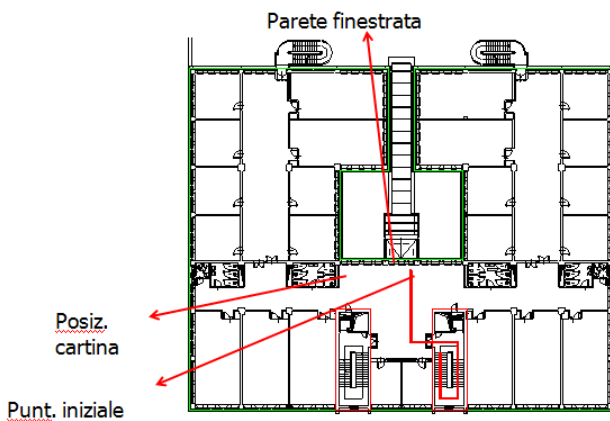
Plan of the 2nd floor of the department of Architecture and tracking paths
